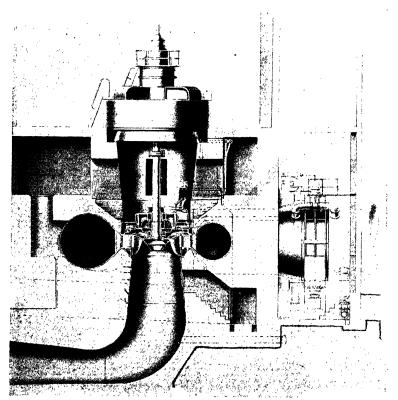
Section through one of the main turbines at Grand River Dam, showing 15-ft butterfly valve. (Courtesy of Allis-Chalmers Manufacturing Company.)
